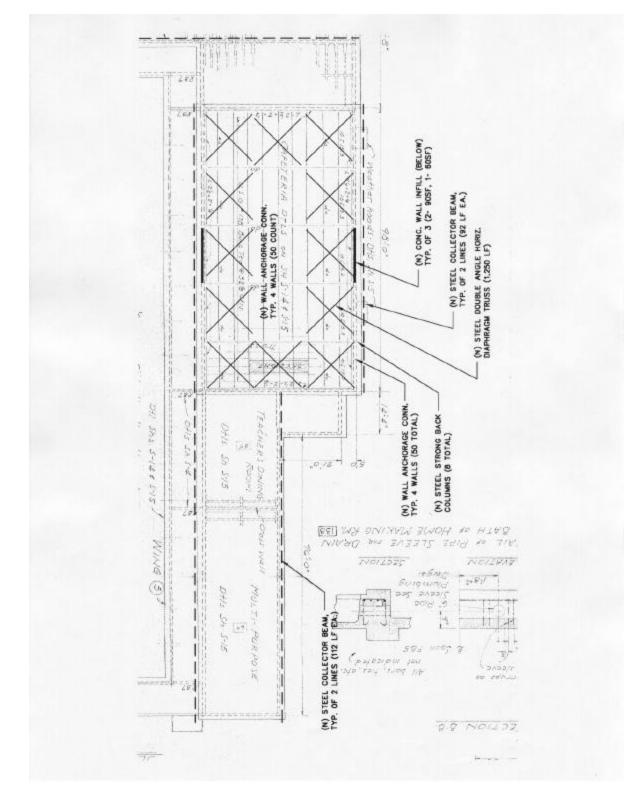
Main Building, Wing 1 & 2 Roof Framing Plan
